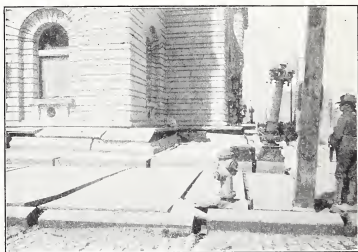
General Postoffice, Southwest Corner, Showing Severe Distortion and Subsidence of the Sidewalk and Street Levels.
